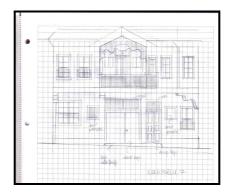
An Example of the Sketches studied in the Site Survey: The Facade of Eskicioğlu 7
